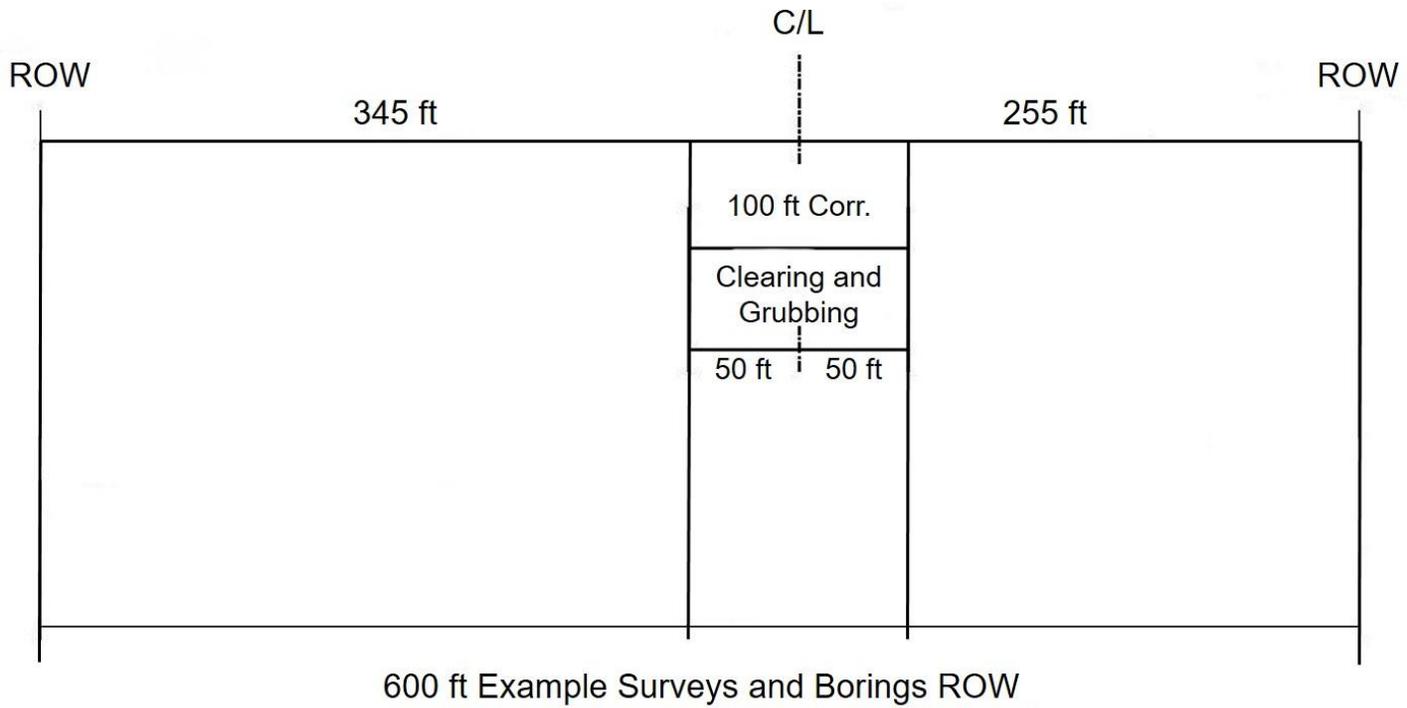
Plan view drawing of a typical ROW for the Proposed Action.
